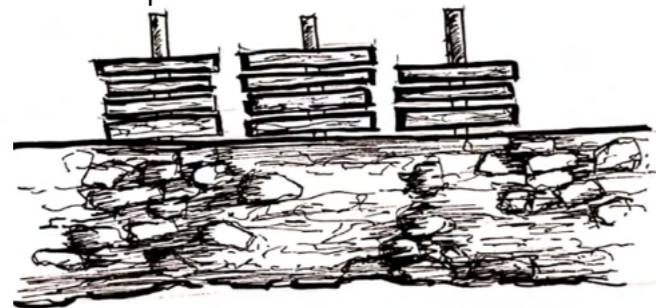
Reinterpretation of Himba graves elevation (Author, 2021)
